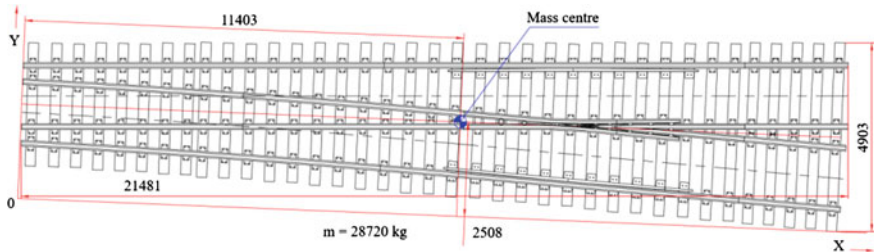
Intermediate crossing assembly (switch R65-300-1:11, drawing no. E14-006/1, Voestalpine VAE Legetecha UAB)
